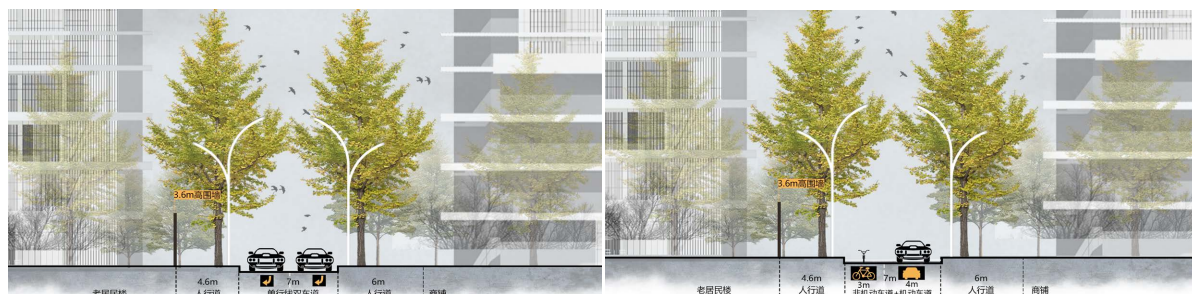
Before (left) and after (right) road renovation in Wenhua Road Street
